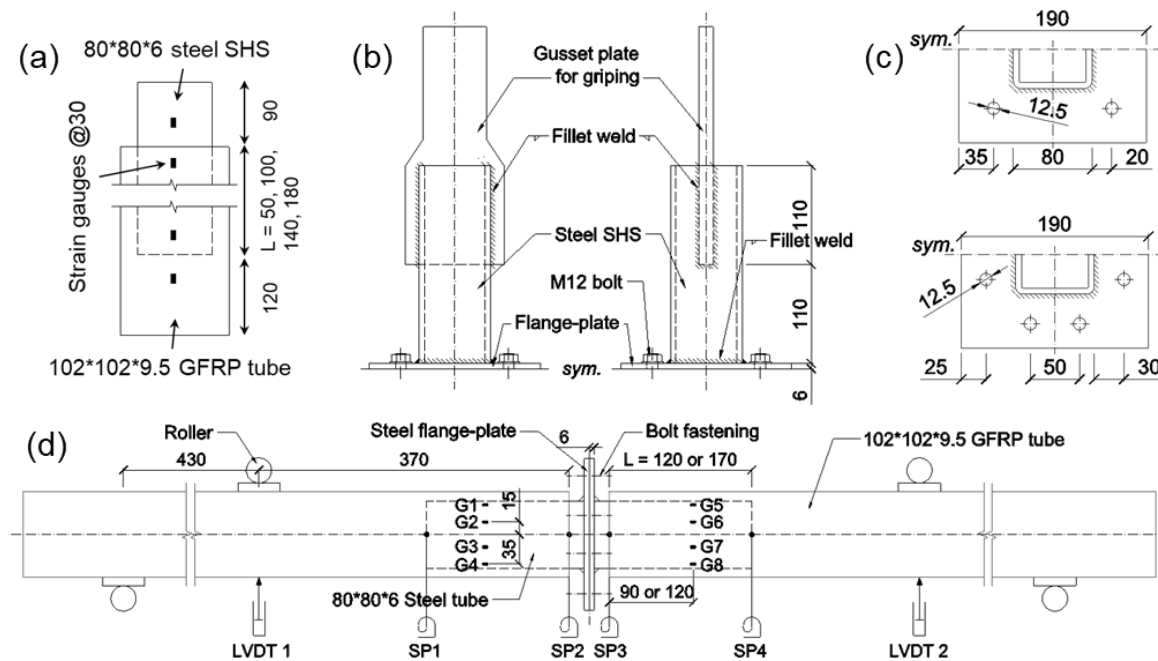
Geometries (all units in mm) and instrumentations (a) A-BSJ specimens; (b) A-BFJ specimens; (c) steel flange-plates for A-BFJ and bending specimens; (d) bending specimens B-170-4 or B-120-8
